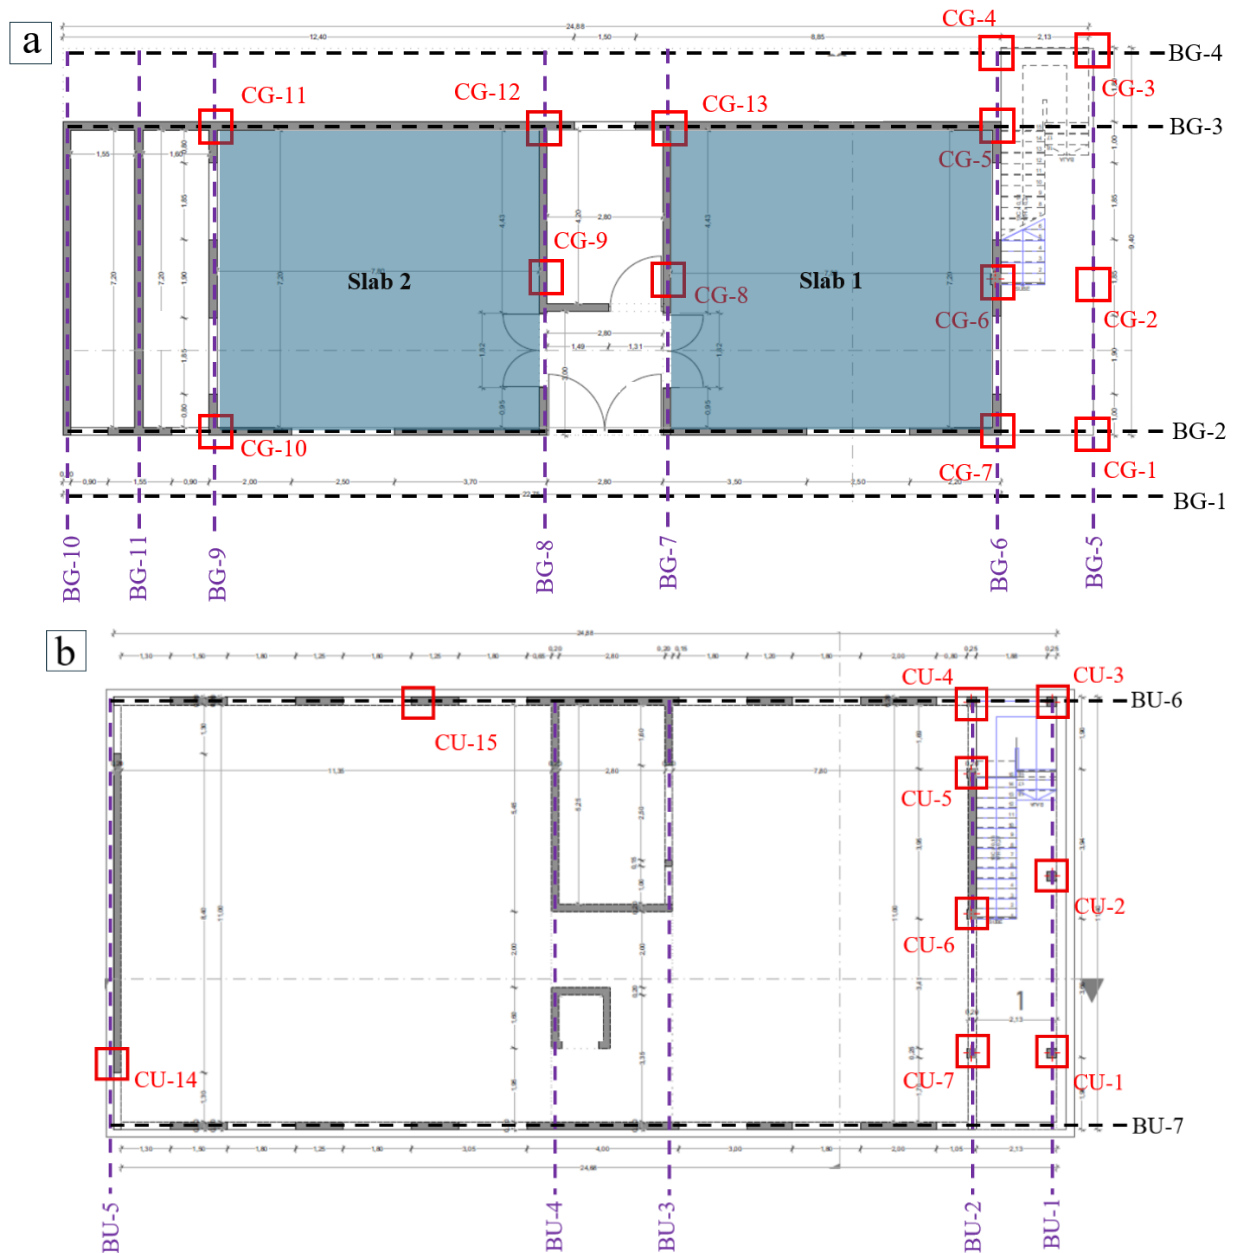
Building plans: (a) ground floor and (b) upper floor.
